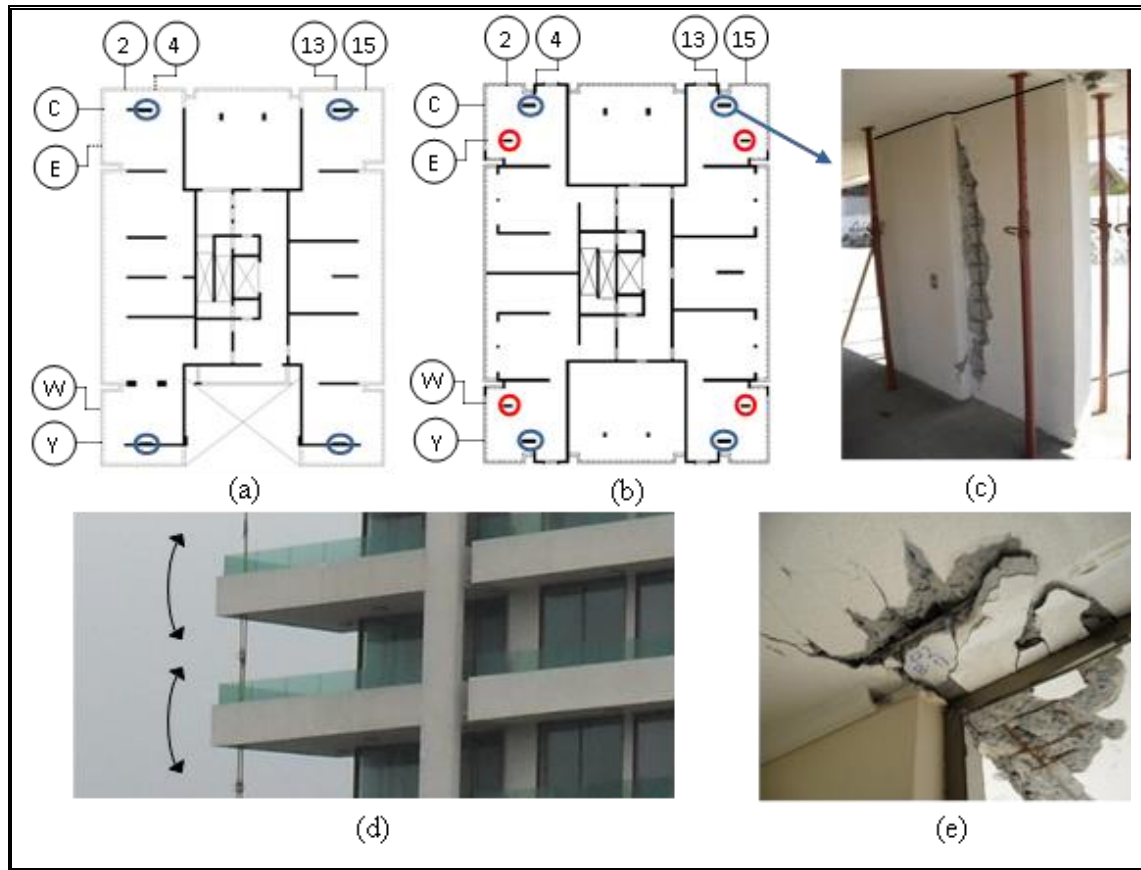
Building AH-2. (a) Story 1 of AH-2, (b) story 2 of AH-2, (c) shear damage in first story wall, (d) slab movement and (e) punching of walls through slabs
